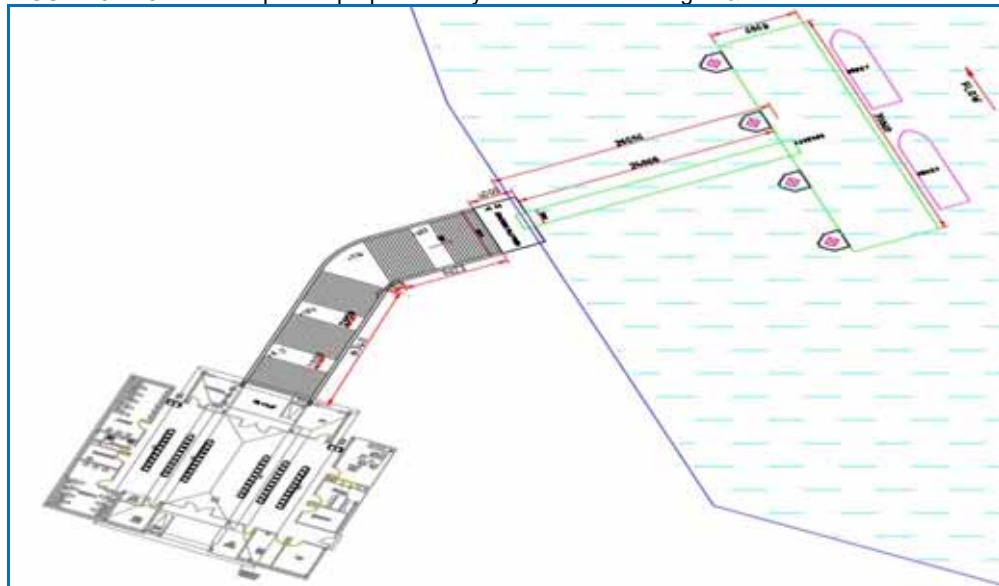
Overall site plan of proposed ferry terminal at Virje (D/s- Kadra Dam)
